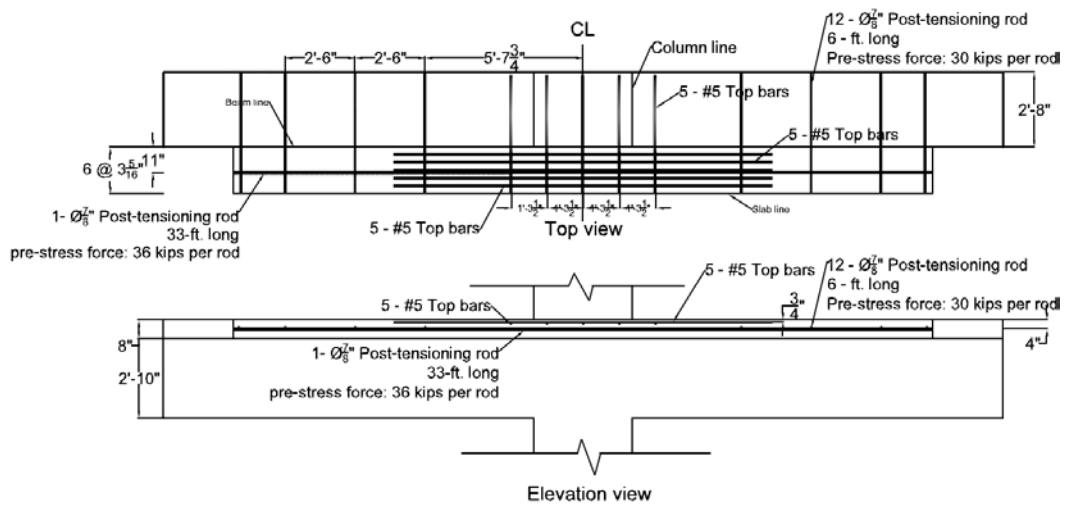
Details of steel reinforcement and posttensioning plan for slab
